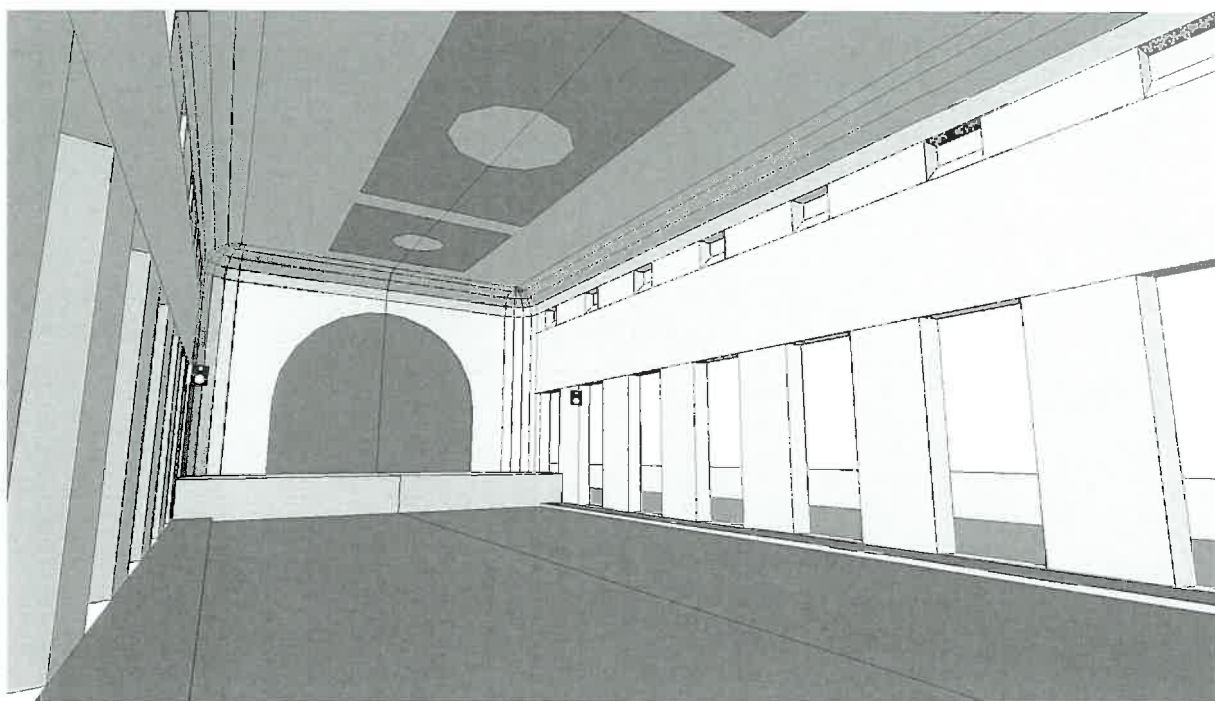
Option B, Ceiling panels and Barrisol screen in east wall alcoves
